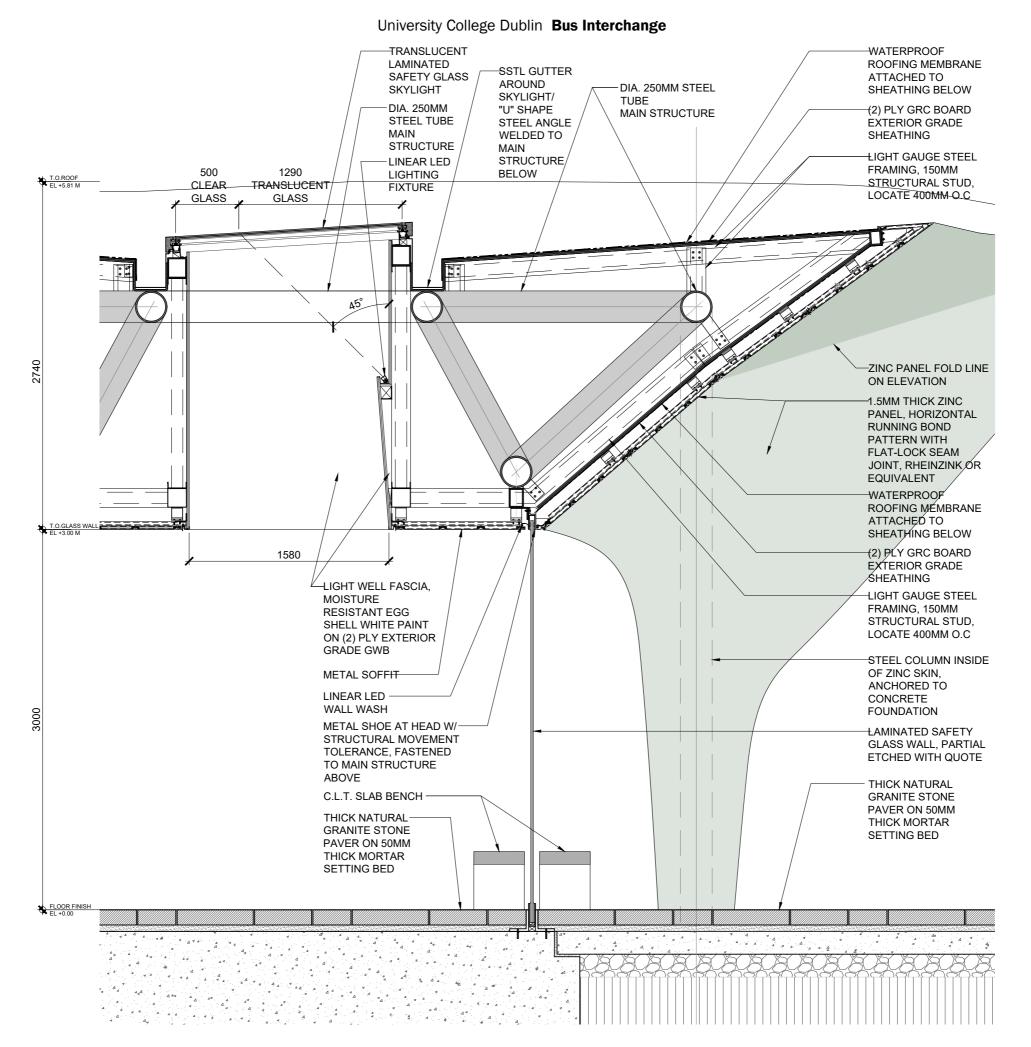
TYP. WALL SECTION, SCALE=1/30
